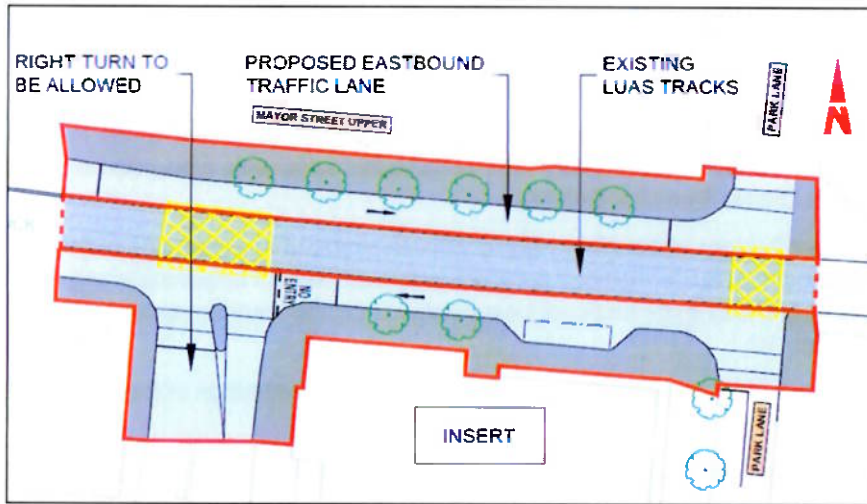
Extract from General Arrangement Drawing Sheet 3 Part 3 North
